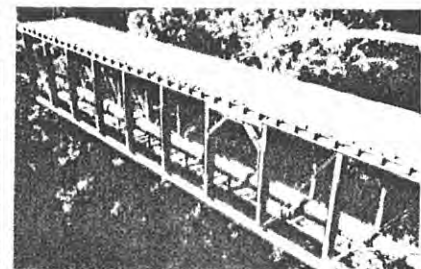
Road bridge designers of the Public Works Department also designed railway bridges as the 1908 pony truss shows. Deck trusses were more common for railways and the viaduct (right) at Gundagai has 78 of them, each of about 11m span. The viaduct was completed in 1903.
